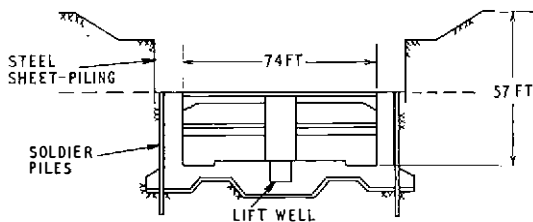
CROSS-SECTION OF STATION EXCAVATION NORTH-SOUTH
